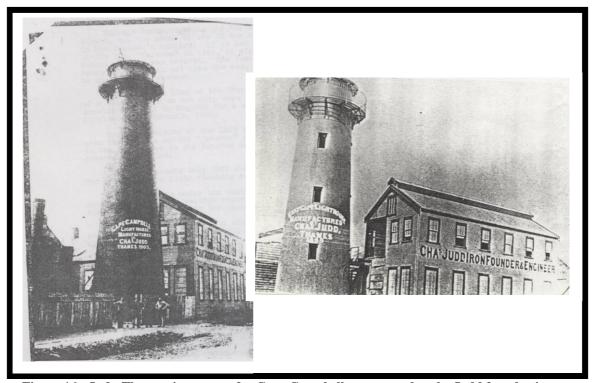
Left: The cast iron tower for Cape Campbell constructed at the Judd foundry in Thames. Right: The cast iron tower for East Cape on the lot in Thames.
